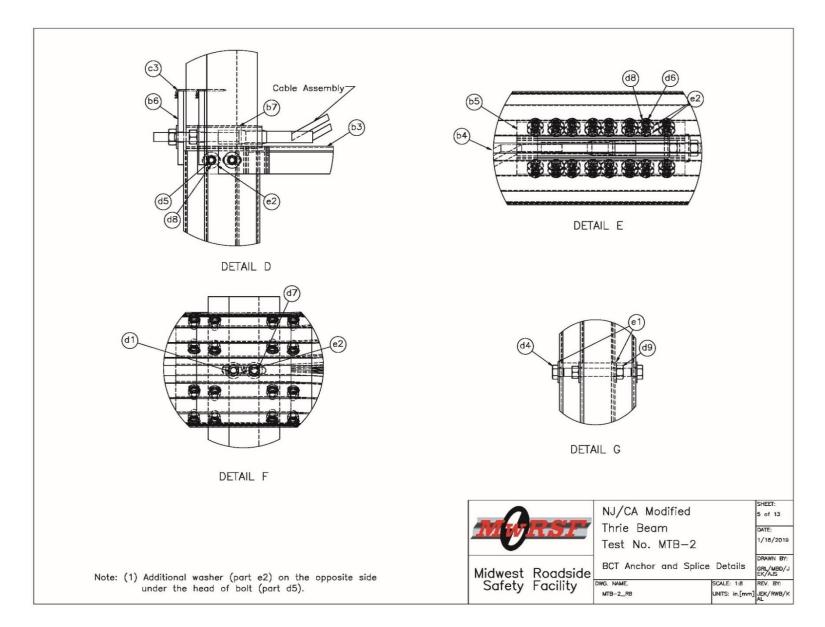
BCT Anchor and Splice Details, Test No. MTB-2
